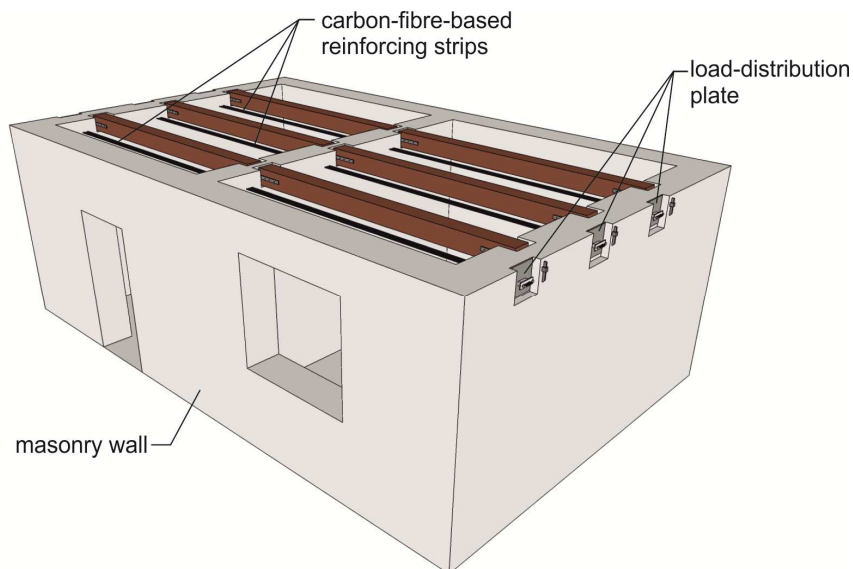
Carbon fibres based reinforcing strips situated in the place of timber beams (Witzany el al., 2011)
